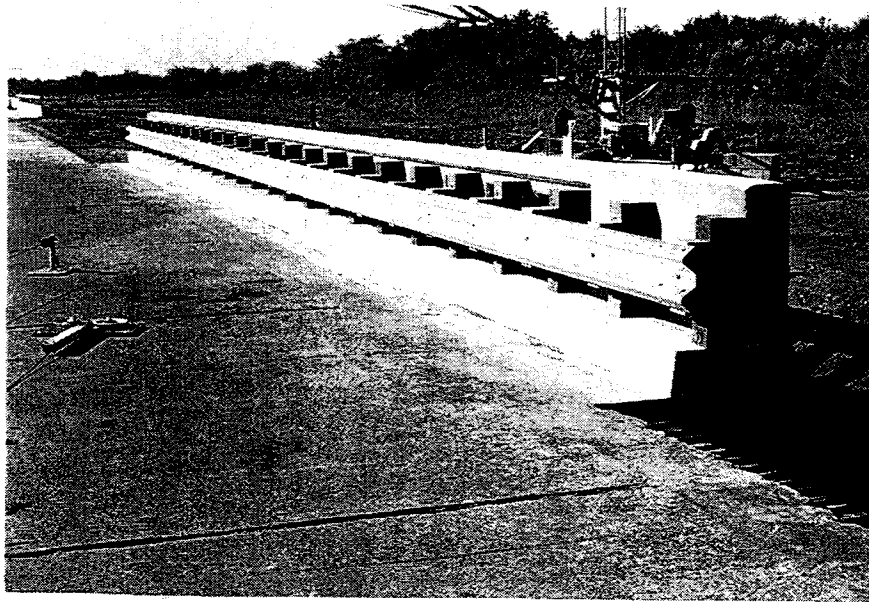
W-beam retrofit for concrete baluster bridge railing used for test 472070-1.
